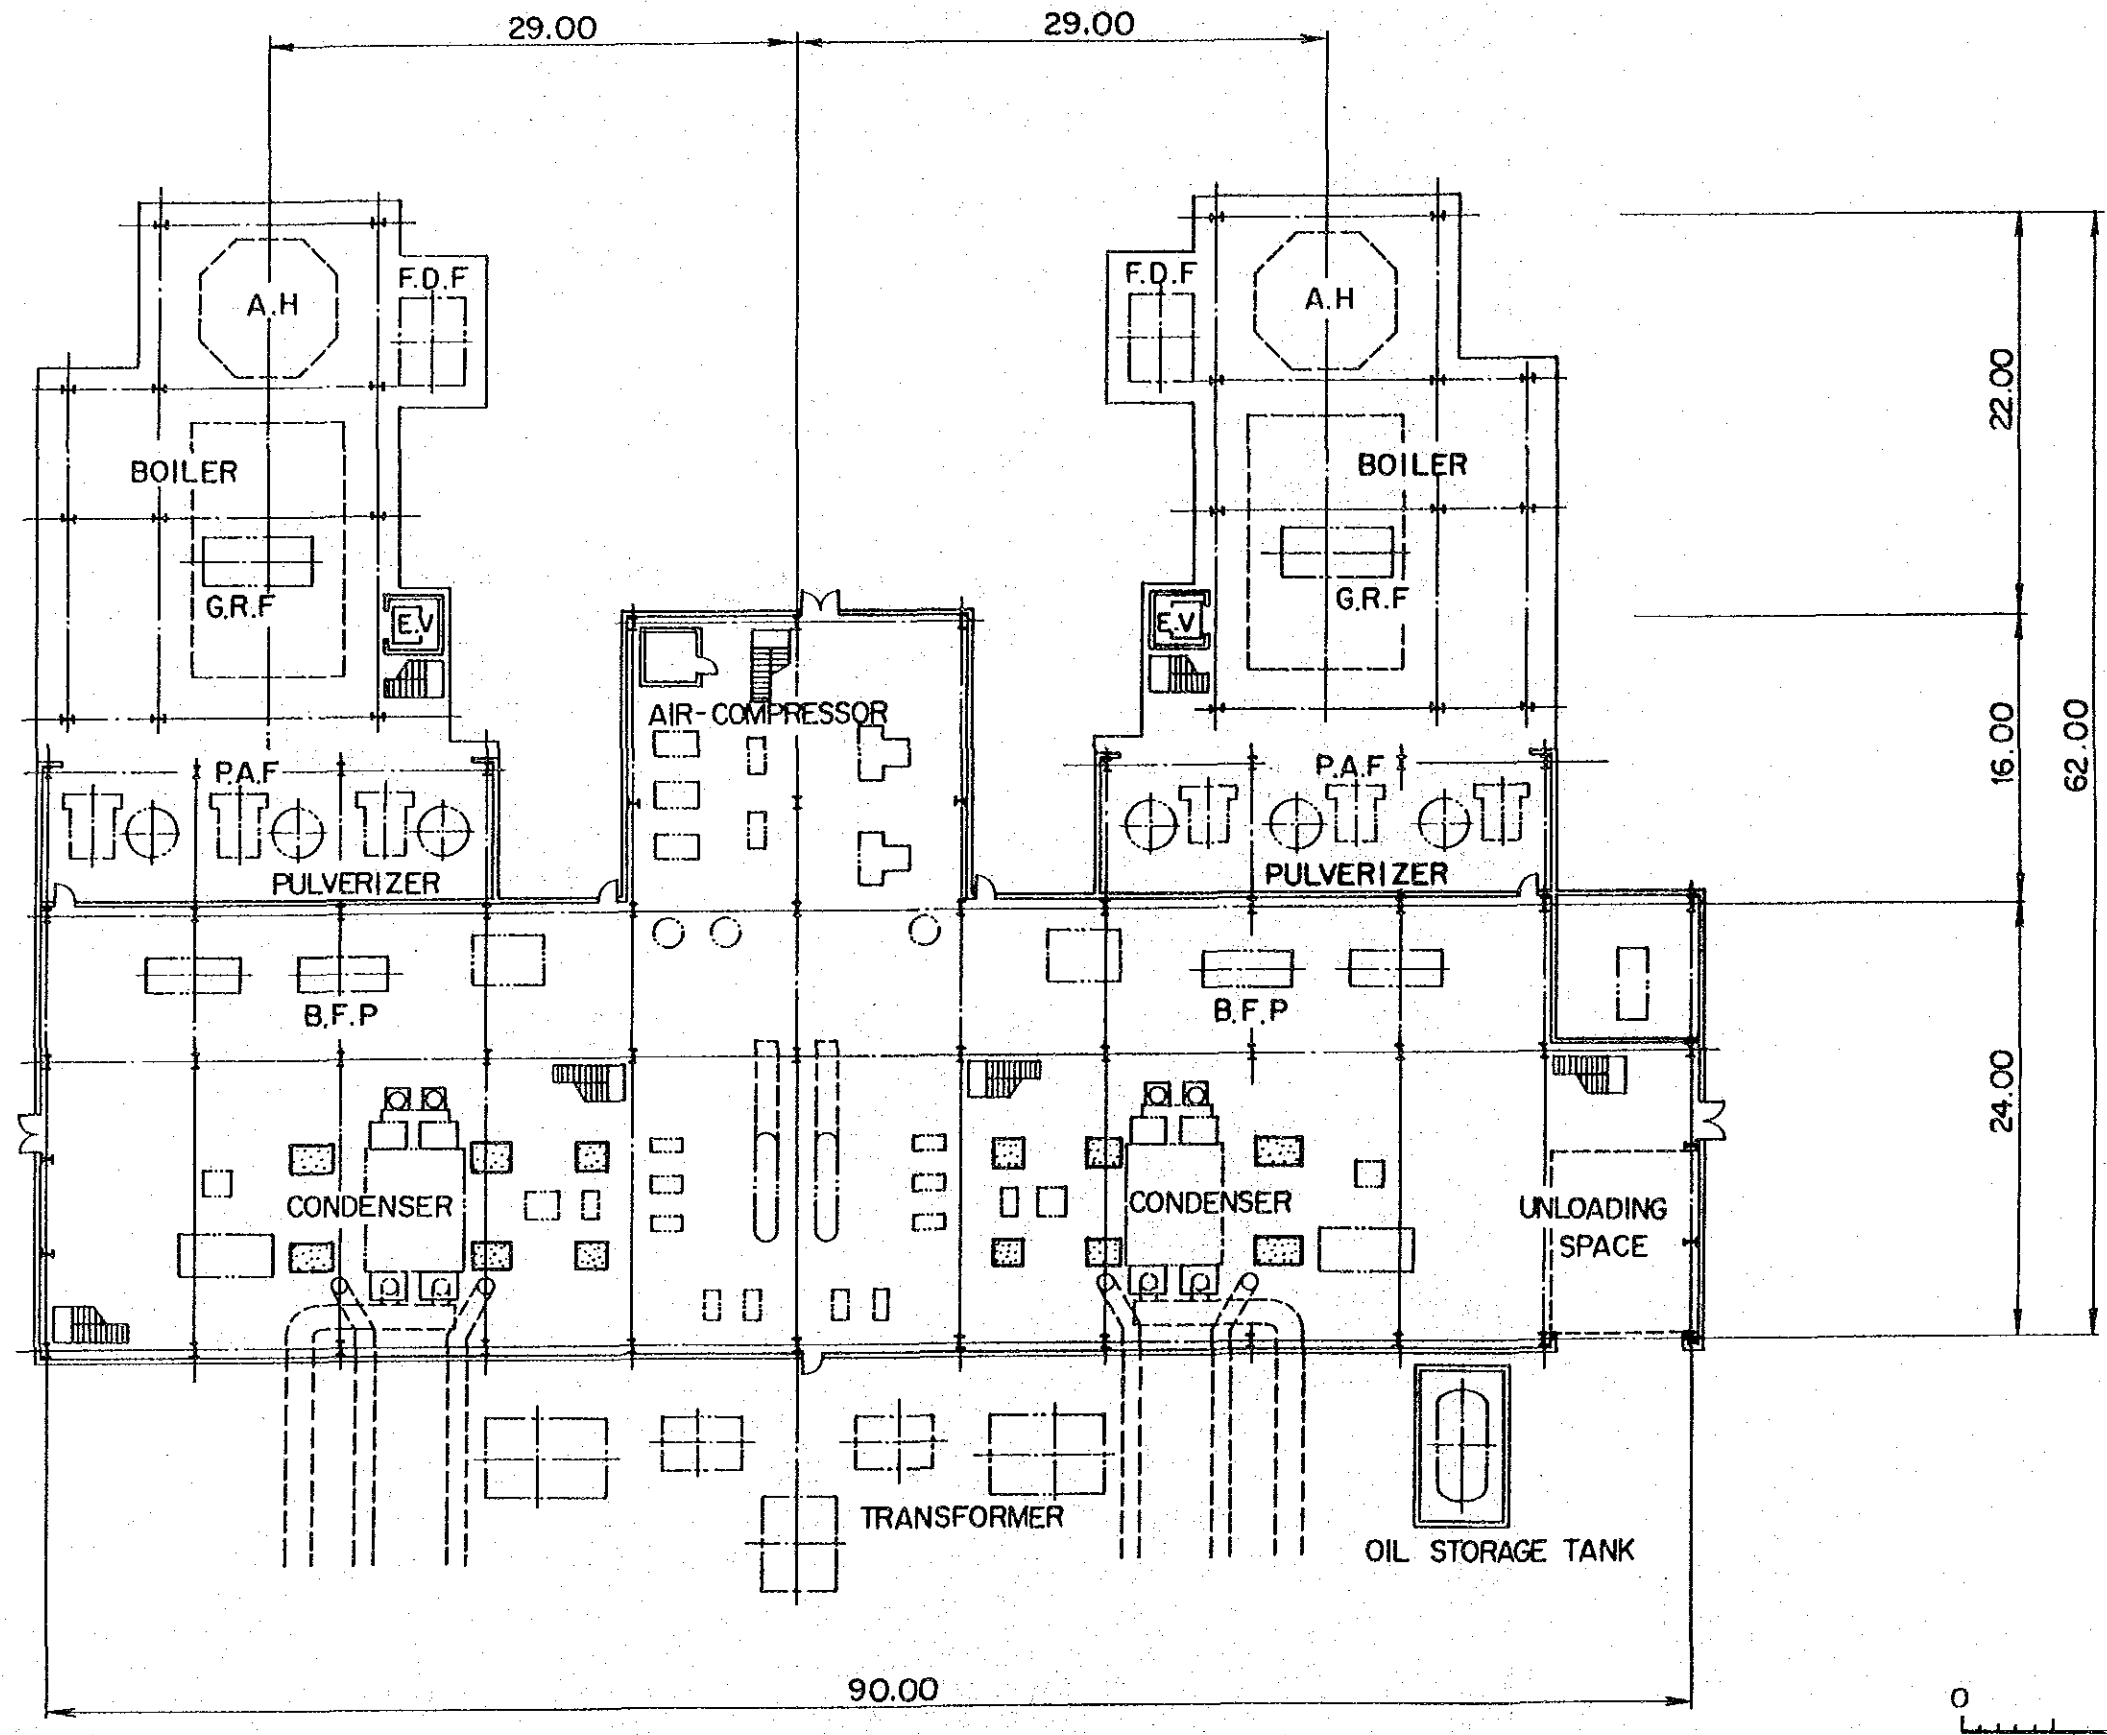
(3) Power House (3rd Floor Plan)
